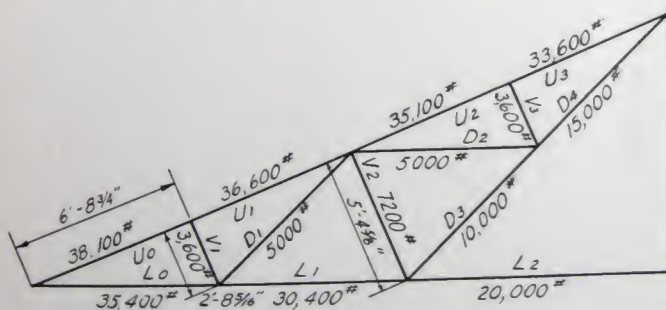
Diagram for One-half of 50 foot Fink Roof Truss Giving Loads for Members with Spacing of Trusses 16 feet on Centers and Combined Live and Dead Loads of 40 lbs. per Square Foot
